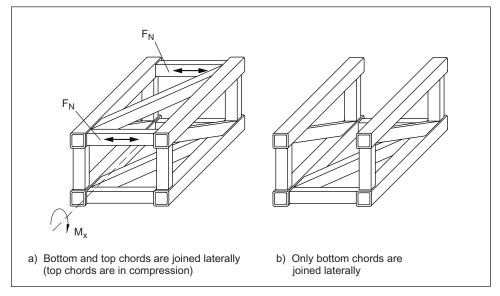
Laterally joined trusses (F_N is the transverse force preventing buckling)
